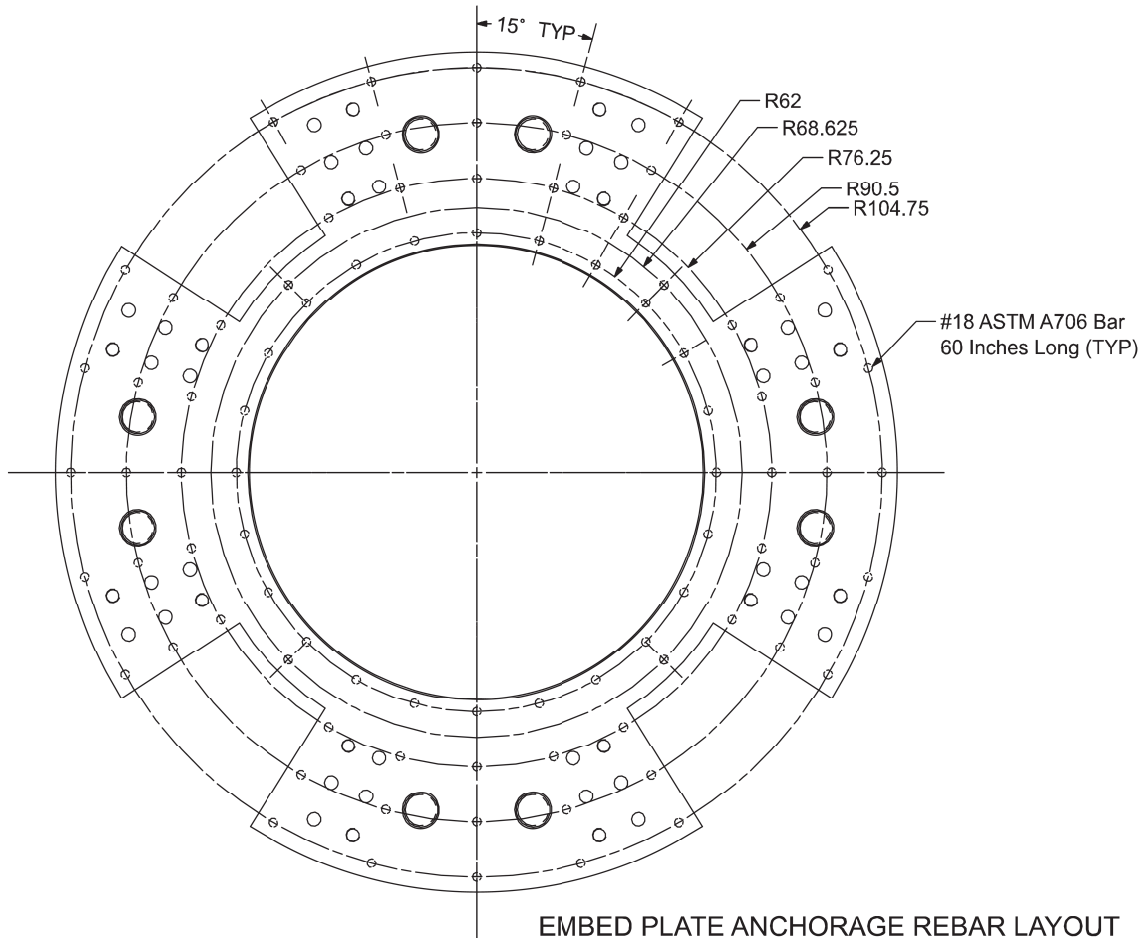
B-50: Plan View of NPM Embed Plate Anchorage and Passive Plate
